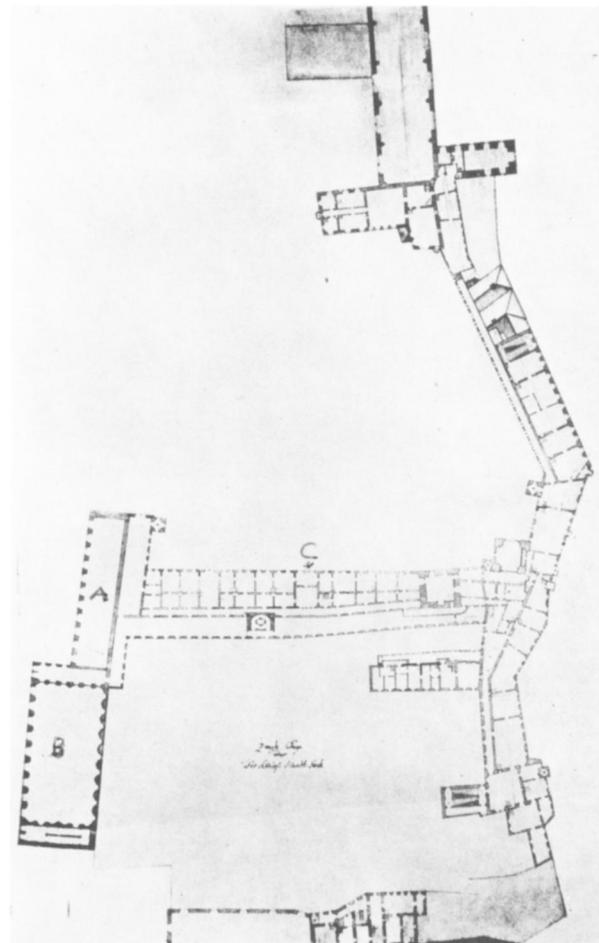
An 18th-century plan of the first floor above ground of the Prague castle, showing (A) the Spanish Room, (B) the New Room, and (C) the adjoining wing with further rooms for the collections. From Krčálová, "Poznámky k rudolfínské architektuře," *Umění*, Vol. 23, no. 6, 1975, fig. 7.
